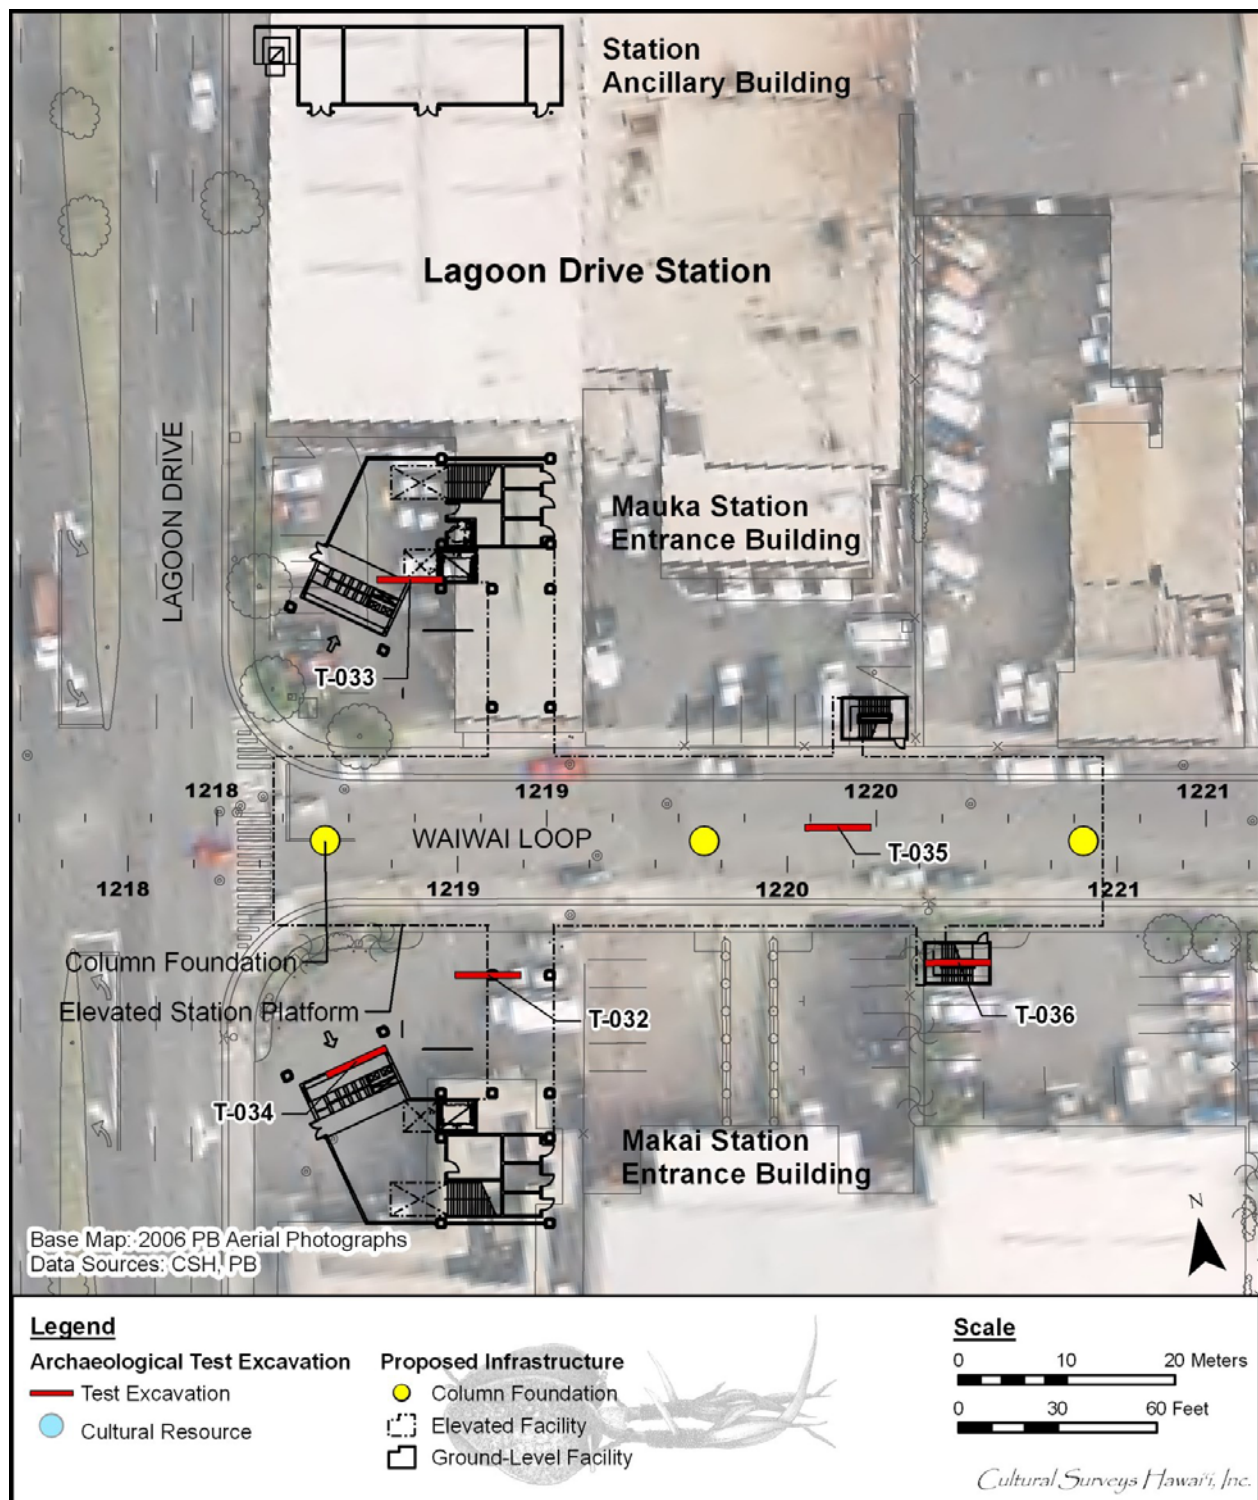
Lagoon Drive Station, five test excavations (T-032 through T-036); two test excavations at Mauka Station Entrance Building, one test excavation at *mauka* access and two at Makai Station Entrance Building
